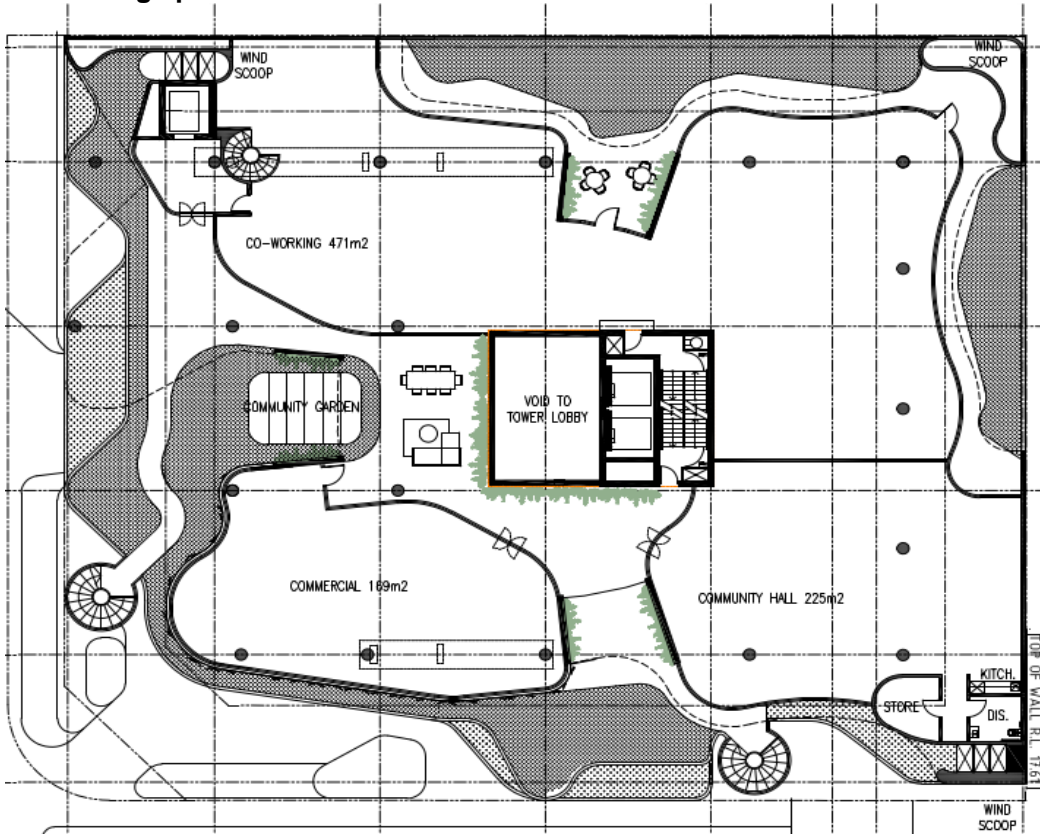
Current Level 1 plan with co-working space increasing by 35m<sup>2</sup>
